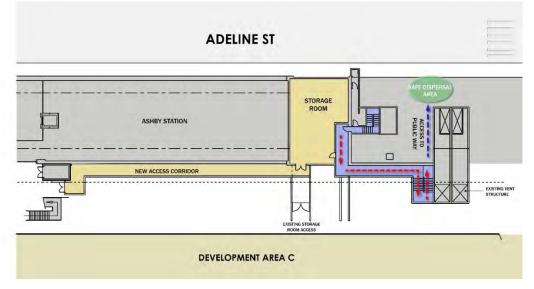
SOUTH PLATFORM EGRESS STAIR ACCESS - OPTION 2 DIAGRAM
